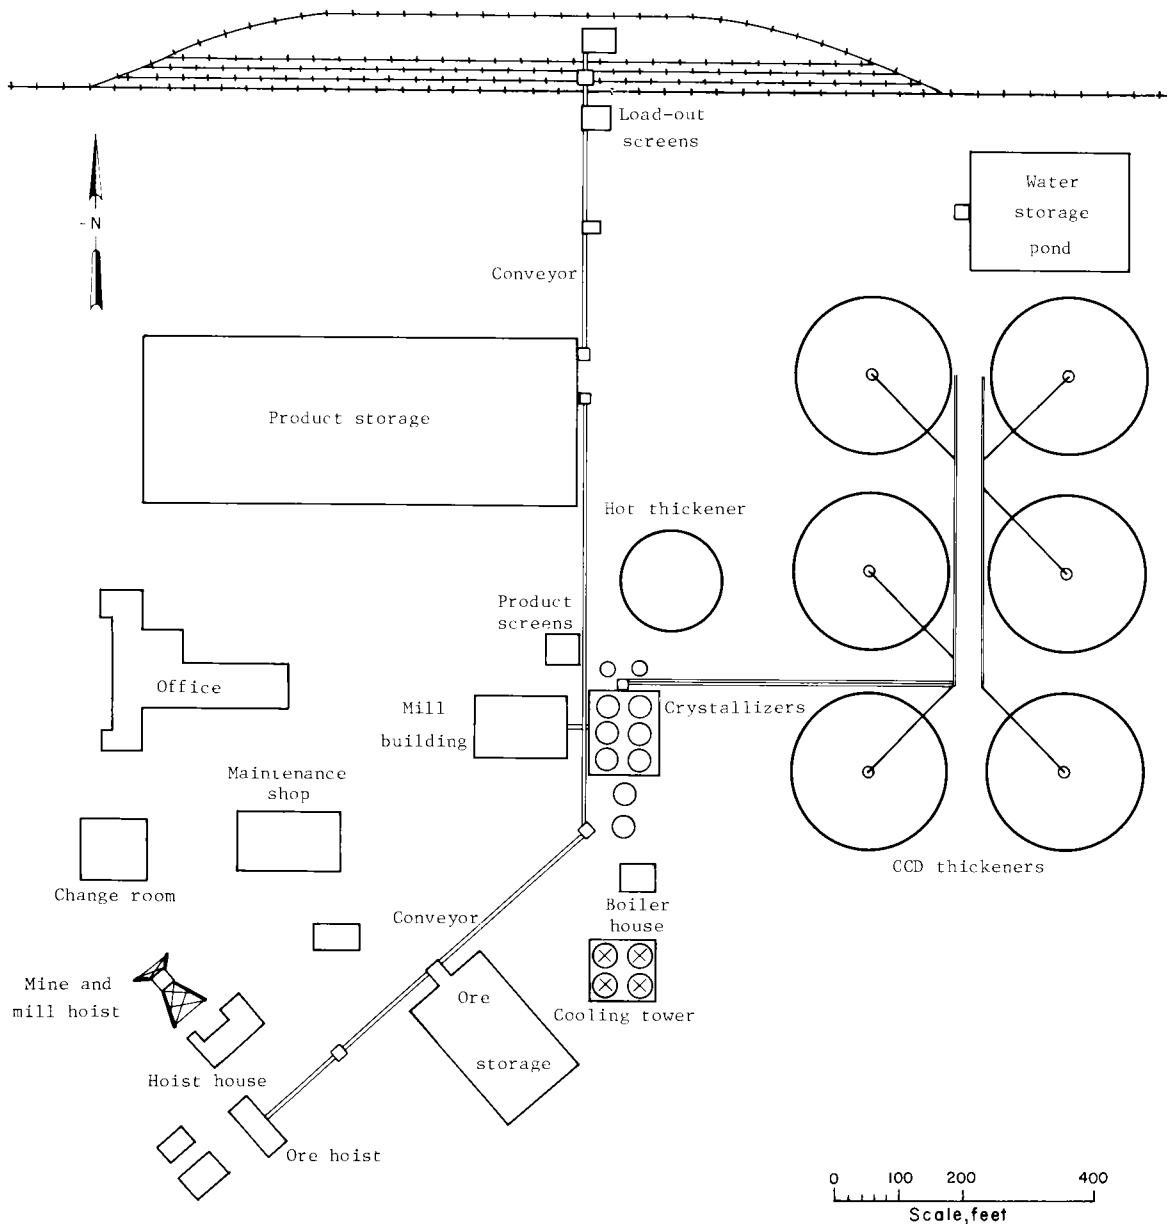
Generalized layout of 8,500-tpd surface plant.
